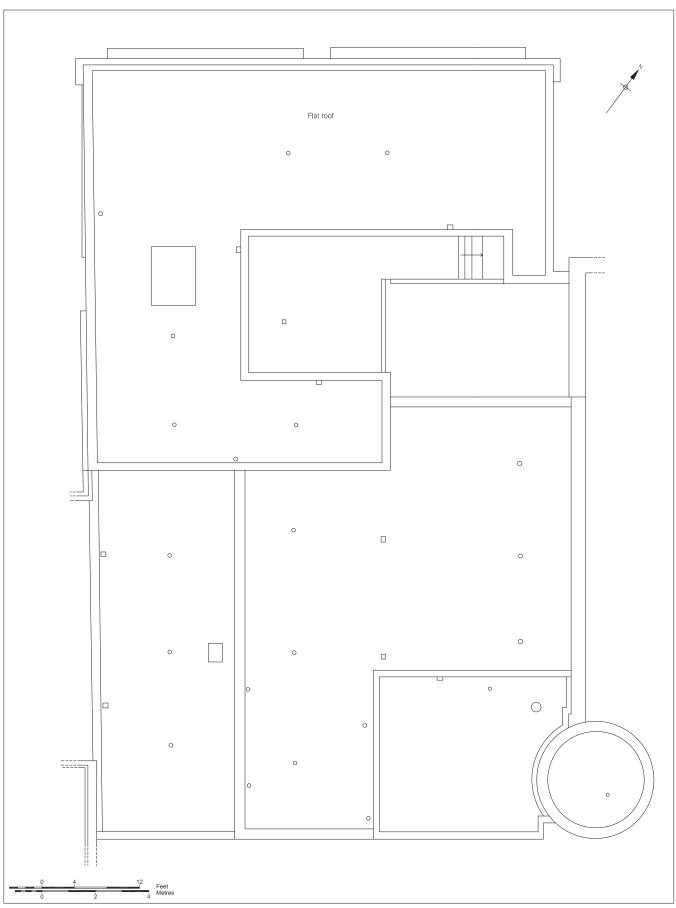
Fourth Floor Plan 1-2 Montague Place British Museum 1:100 at A3
